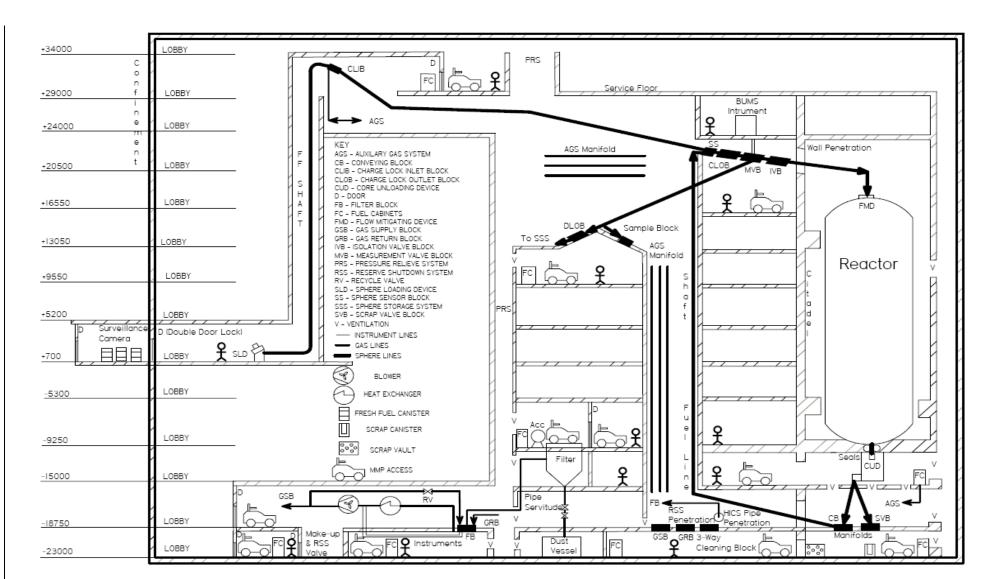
Fuel handling and storage system engineering diagram of maintenance layout
